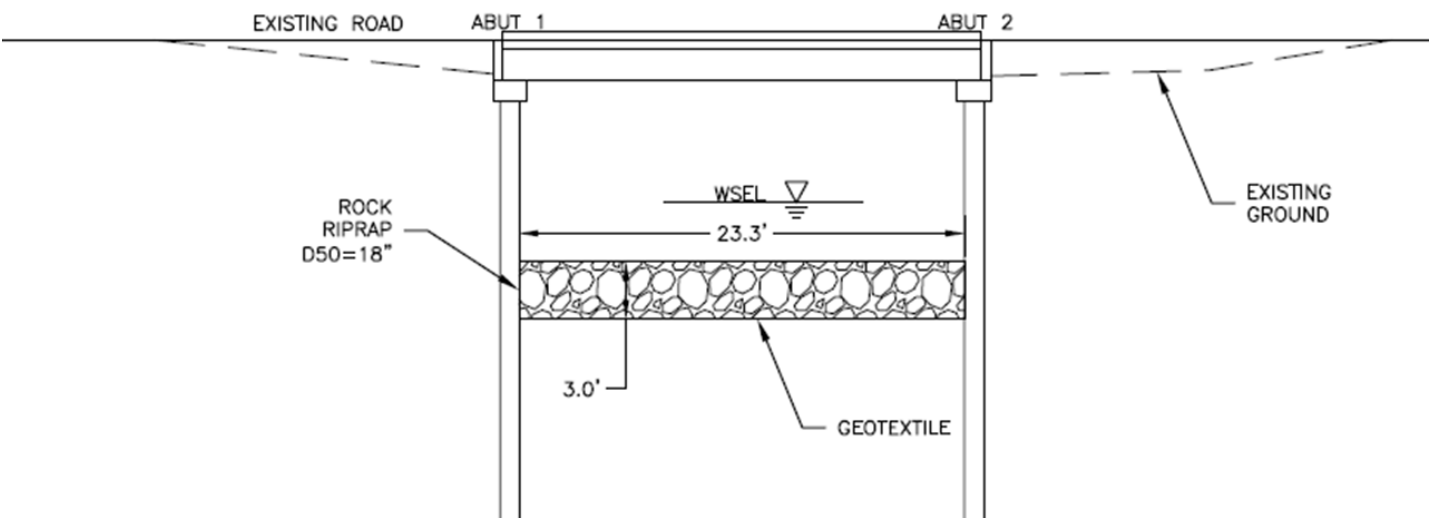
Cross-sectional view of Bridge I-13-I with recommended hydraulic scour countermeasures
